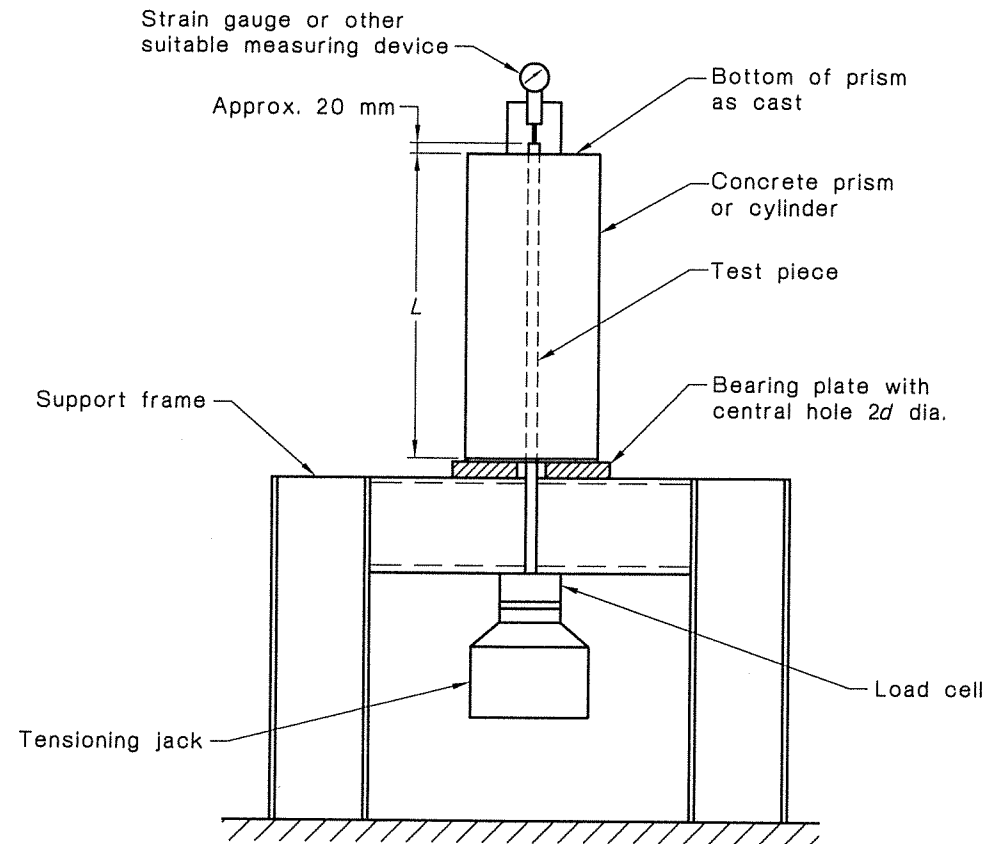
SAMPLE SCHEMATIC ARRANGEMENT OF BOND TEST EQUIPMENT AND TEST SPECIMEN
